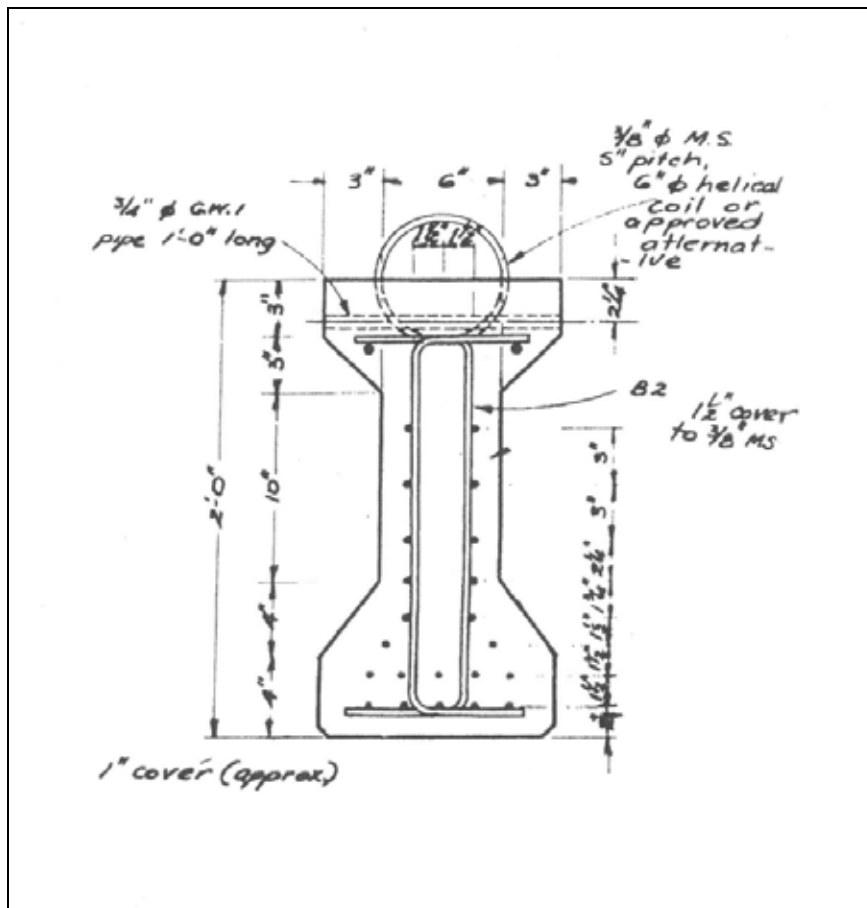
Configuration of stirrups and prestressing wire, H20-S16-44 design (AASHTO 1944).
